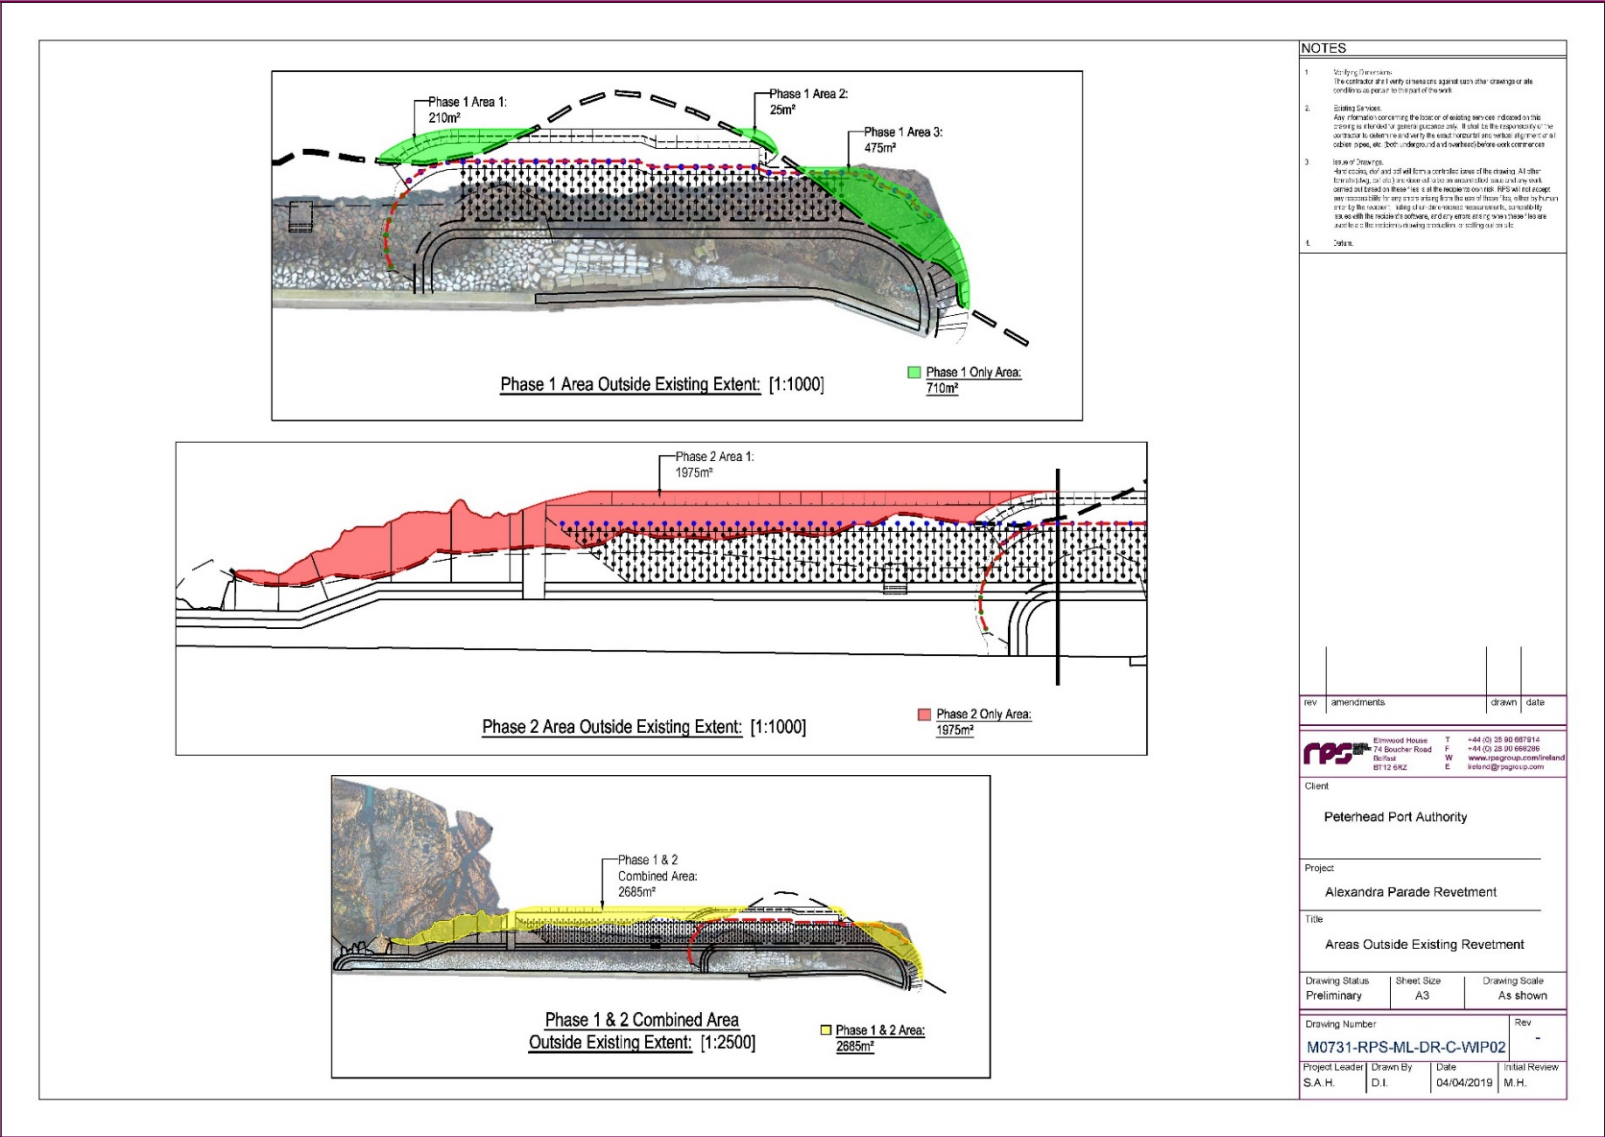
Extent of construction footprint outside the existing revetment boundary.
